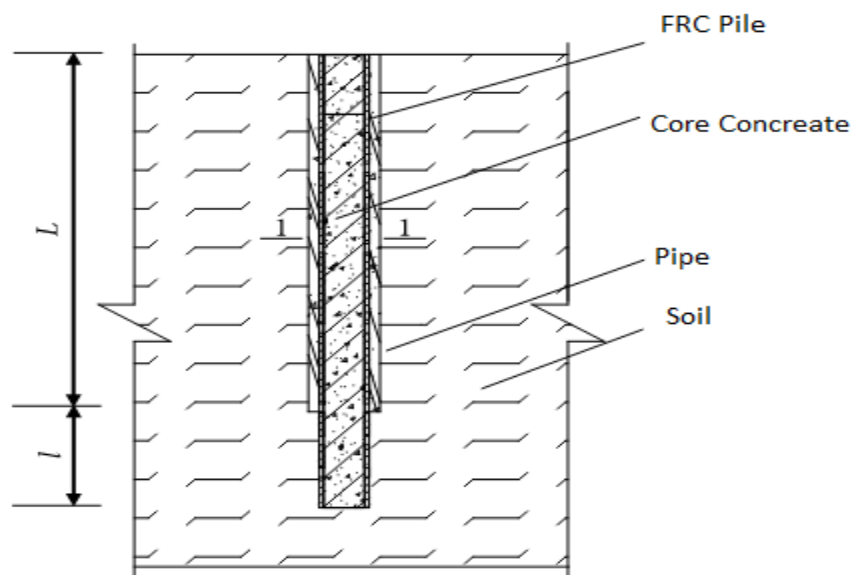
Cross Section of FRC Pile with Lengthened Core-Concrete-Filled Steel Pipe.
